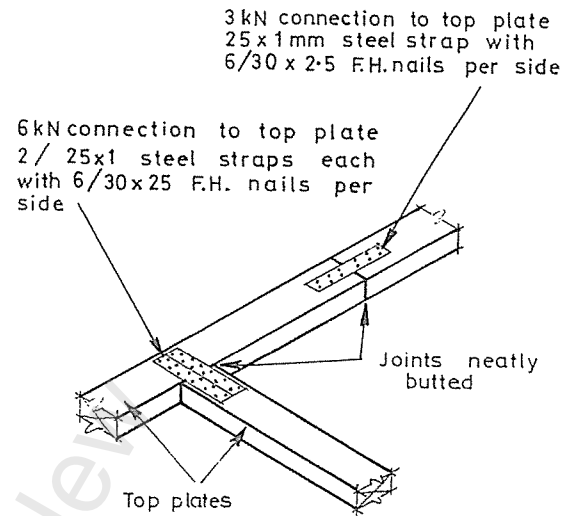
Interconnection and jointing of top plates in walls containing wall bracing elements
